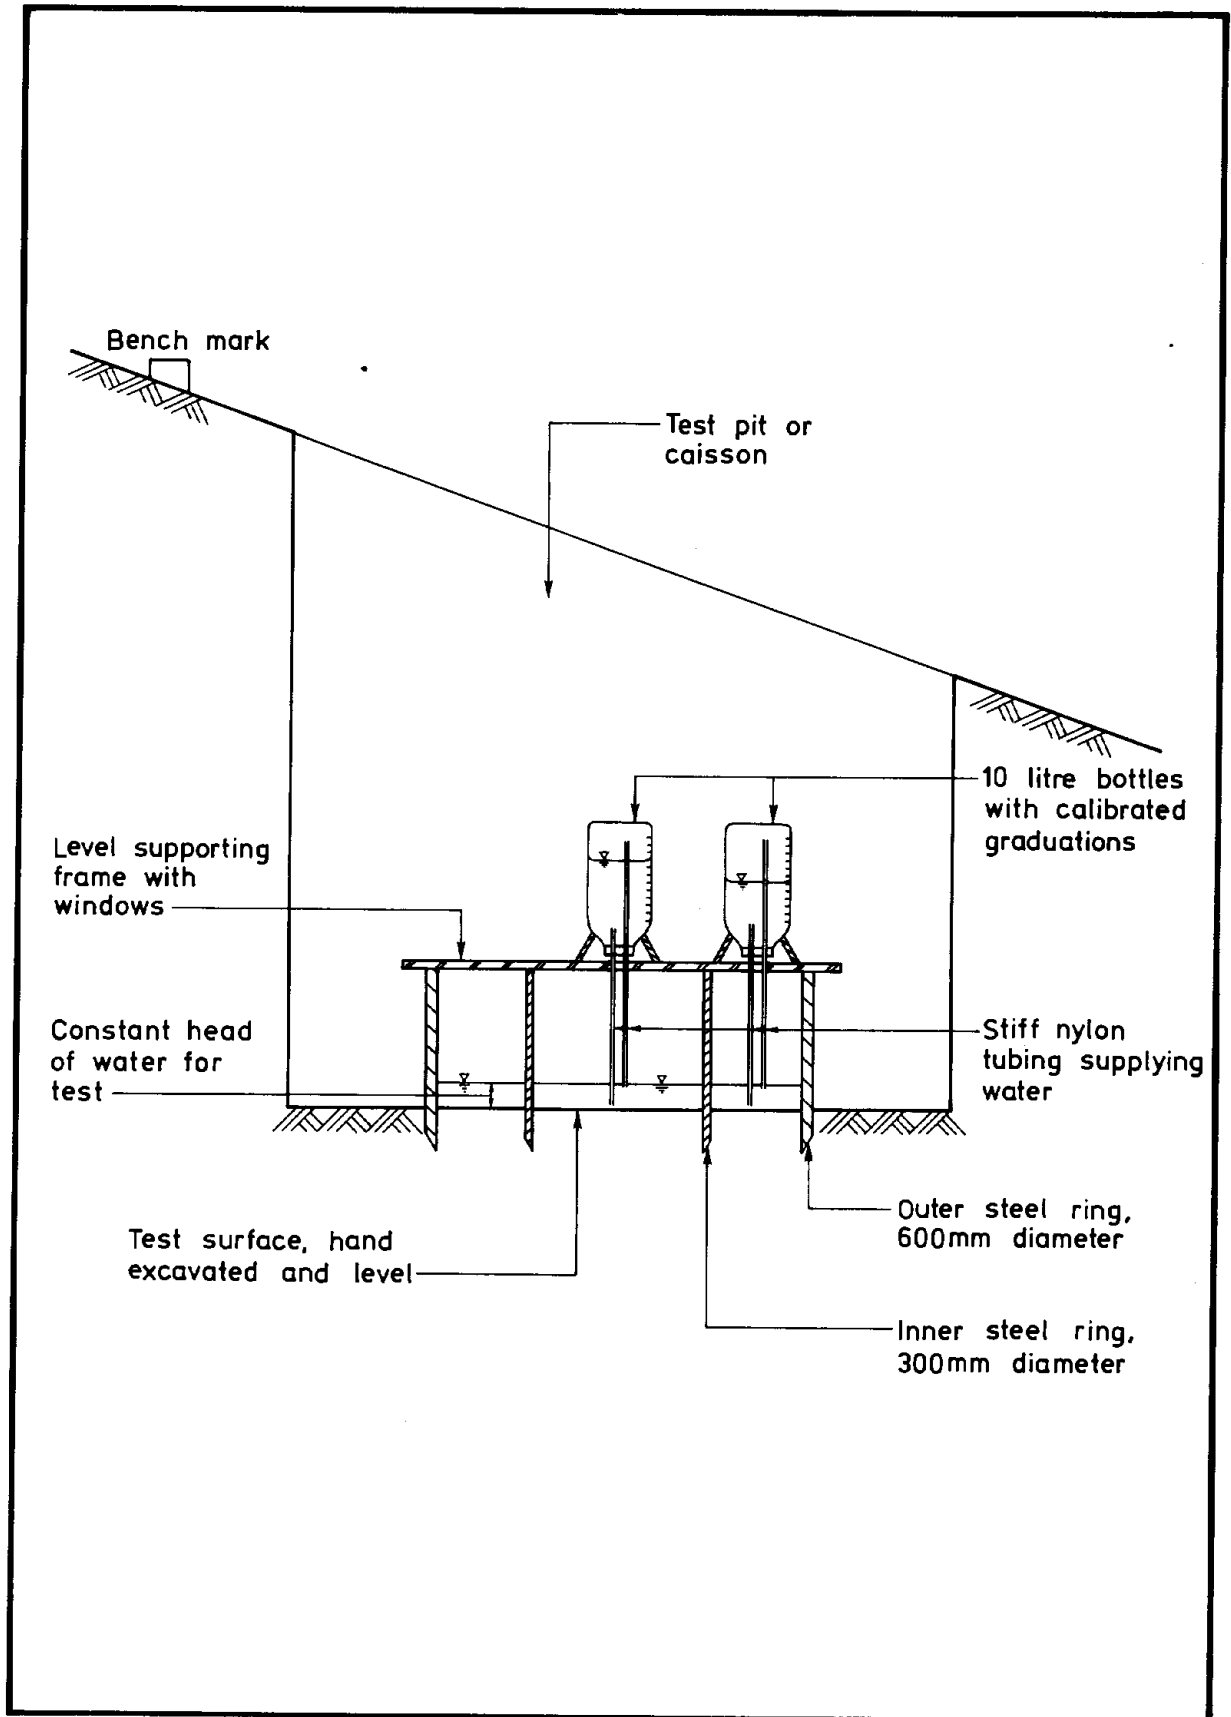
Typical Arrangement for Double-ring Constant-head Field Infiltration Test
